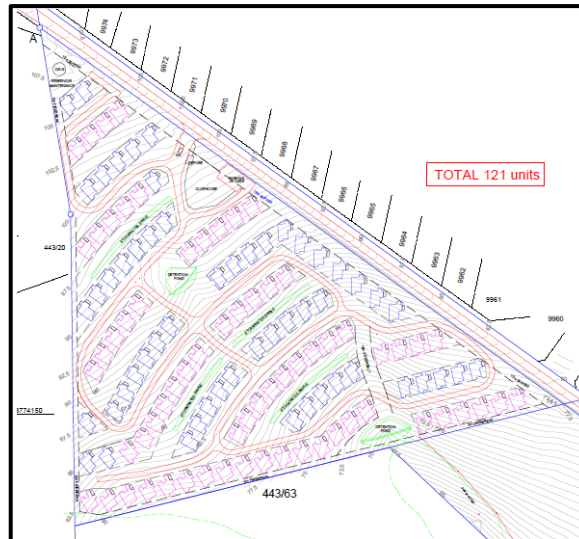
Plan showing the SDP for Portion 59 – Retirement complex
